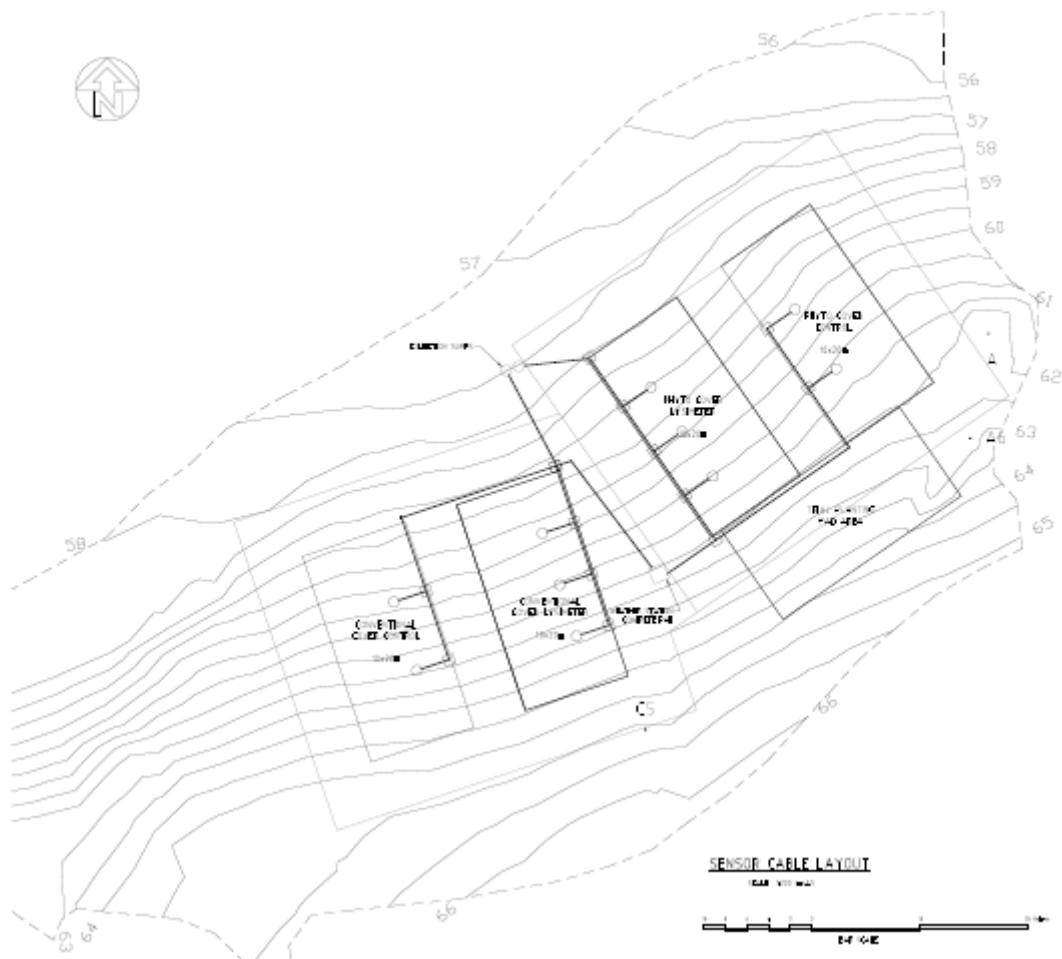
Site Layout and Instrumentation Placement (Tonkin Consulting, 2007)
